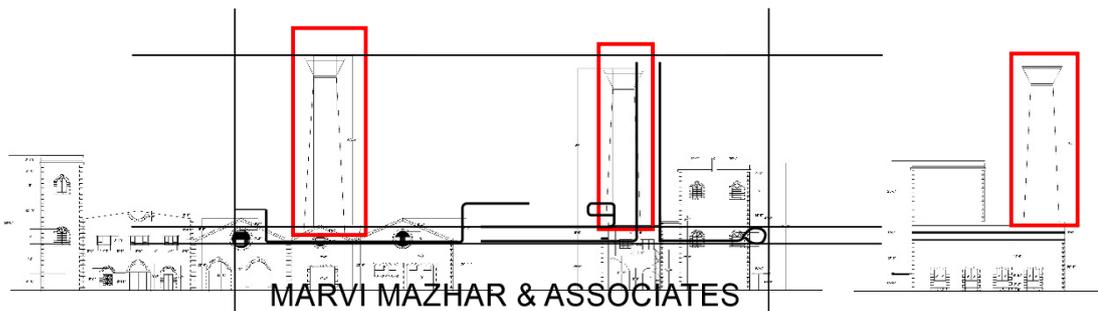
Chimney Tower, South-East Elevation, 15 to 17A Berth, East Wharf, KPT, Karachi.
